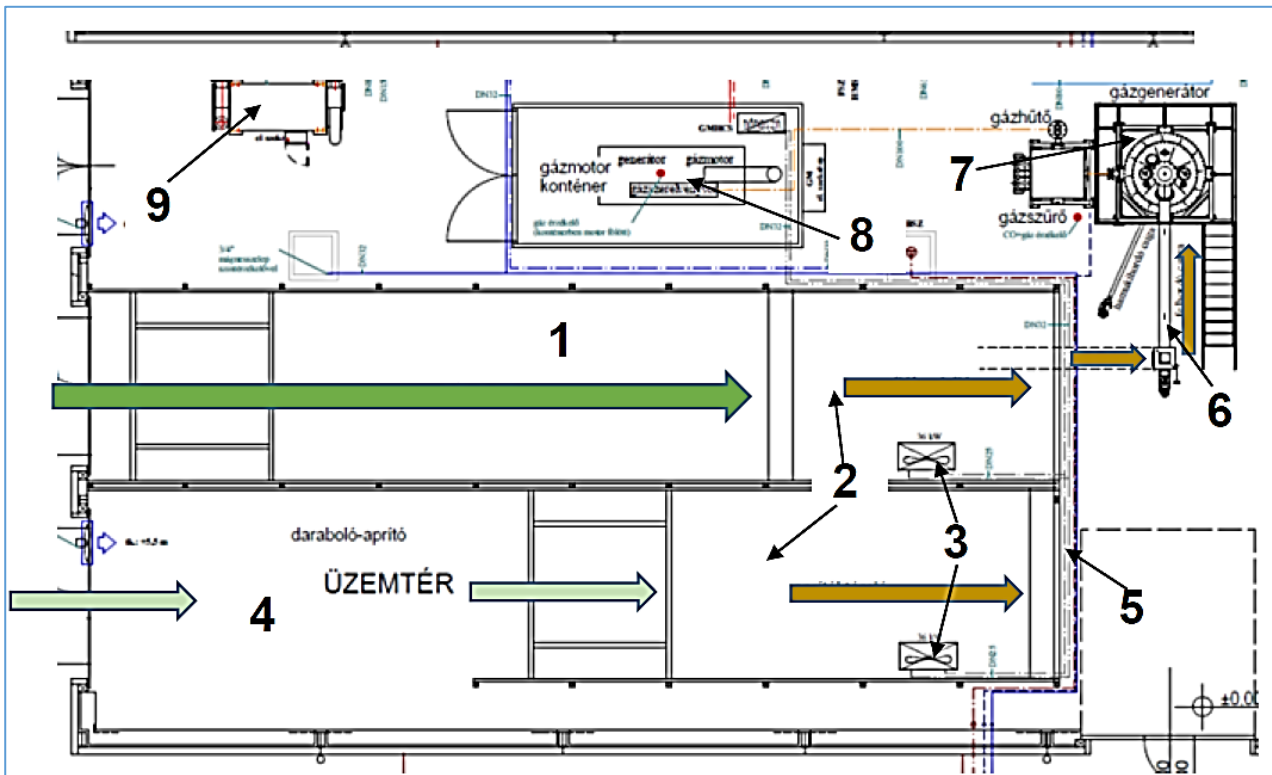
Layout of the complex facility in the building and the connection to the cooling system
